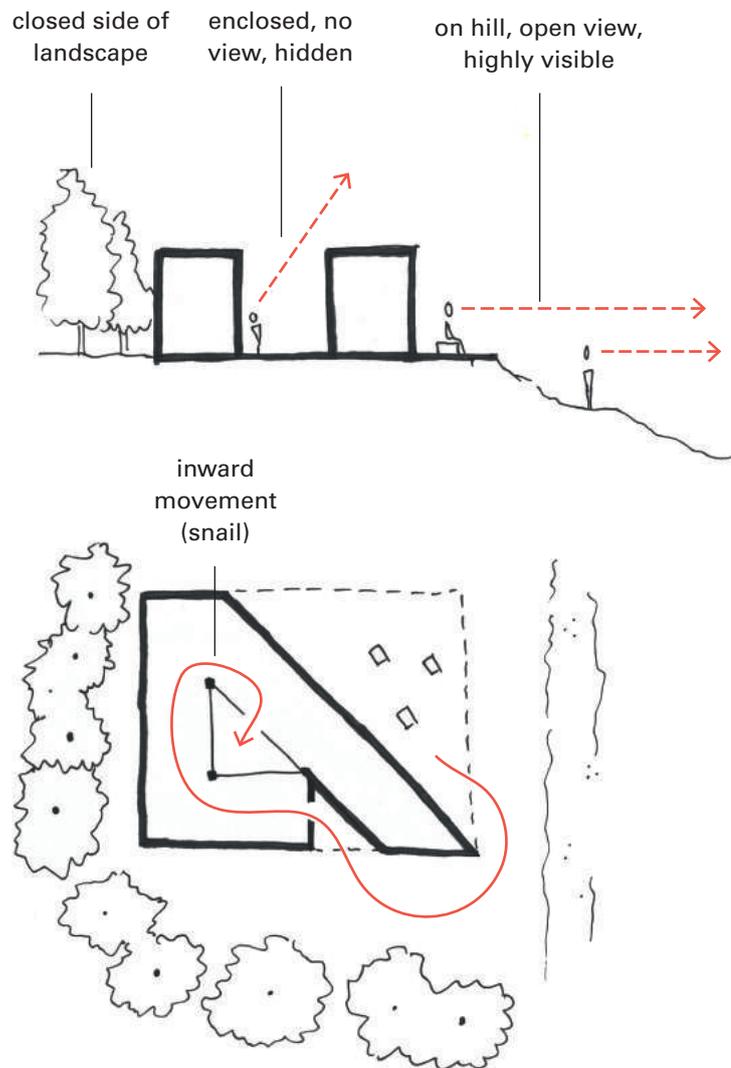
Scheme of section (top) and plan (bottom) of the Schnecke pavilion
